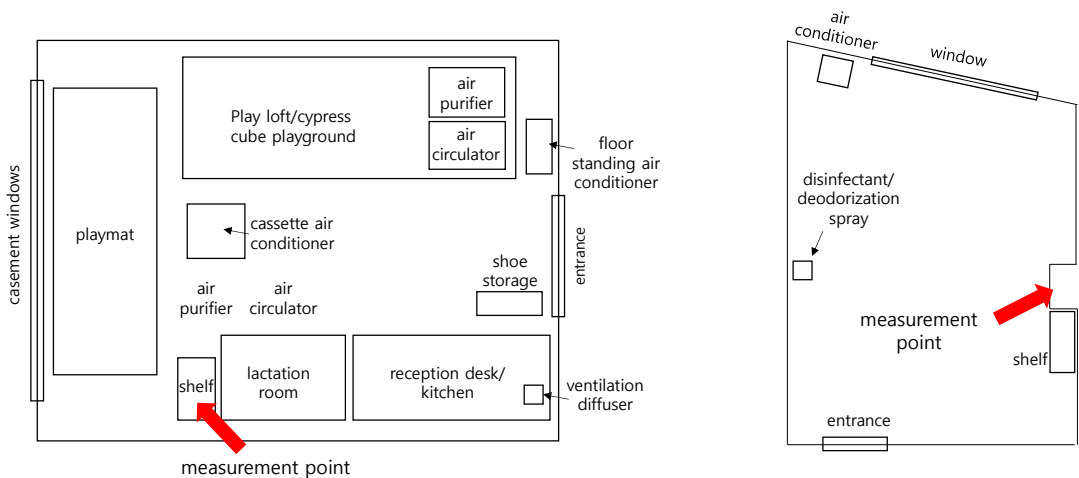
Floor plans of measurement site and measuring points in children playroom (left) and Taekwondo gym (right).
